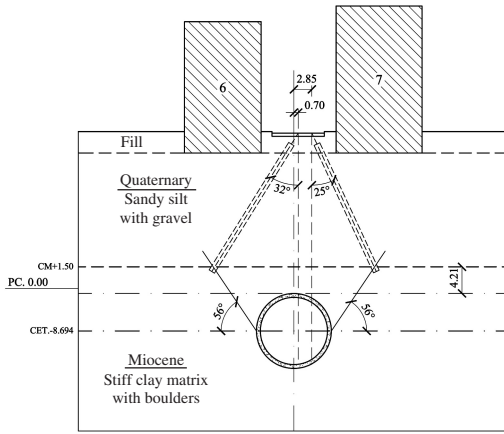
Ground movement control by means of jet grout columns. Typical cross section.
